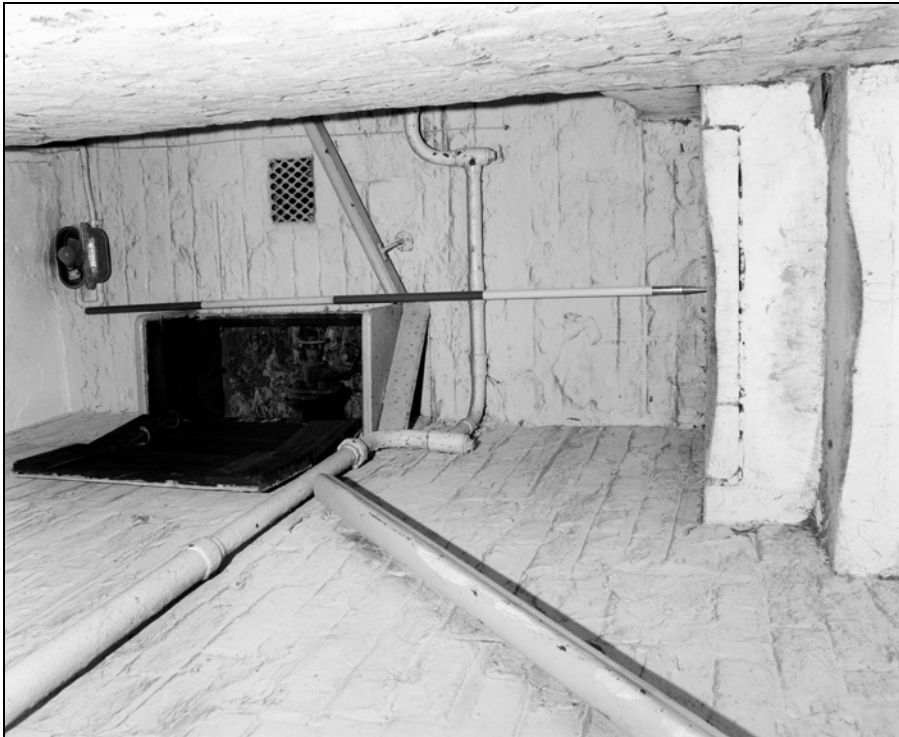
Building 2; ground floor, general shot up stairs by A5 (Film 13.9)
